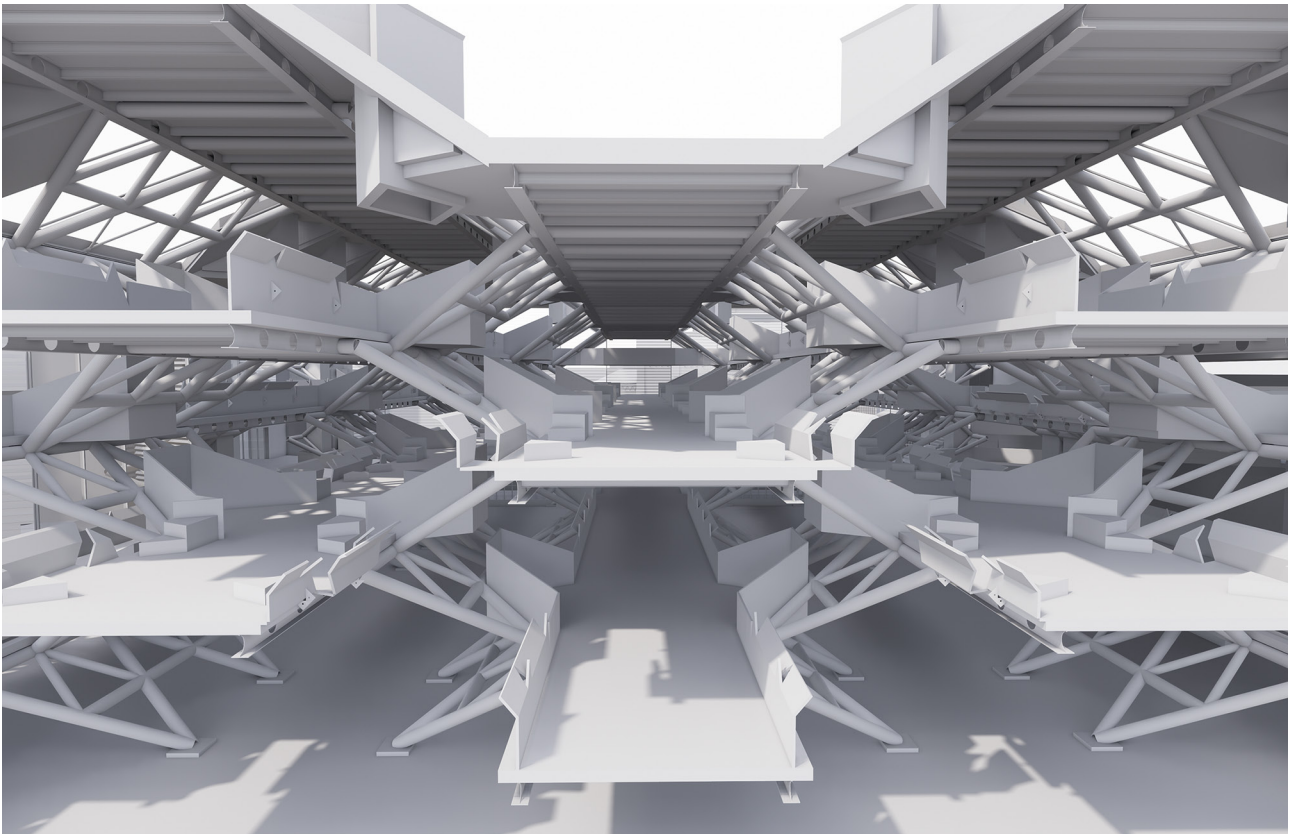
Structural model: axonometric view of steel sloped abutment (Image by P. Borin).
